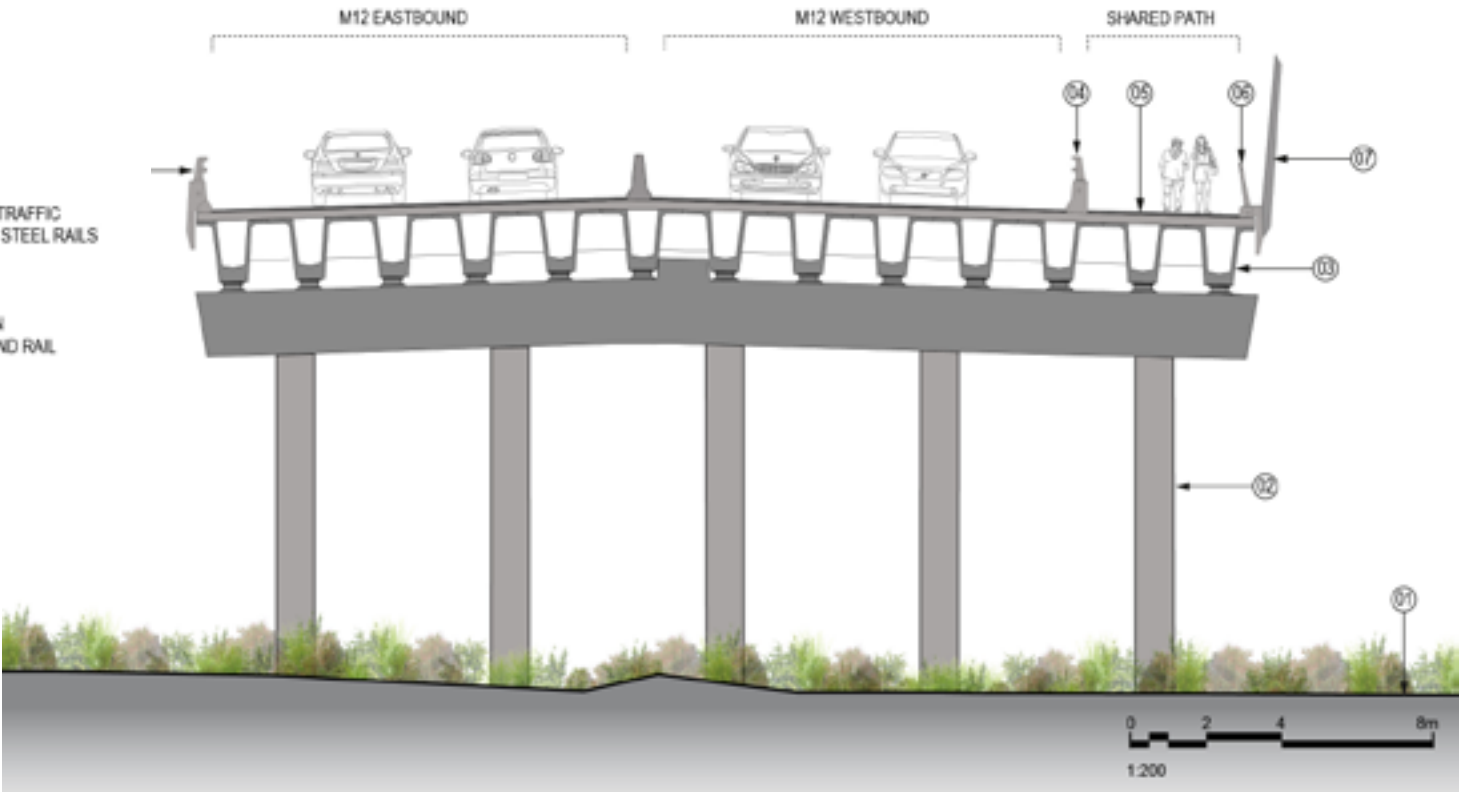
Section - BR02 - Bridge over Cosgroves Creek
